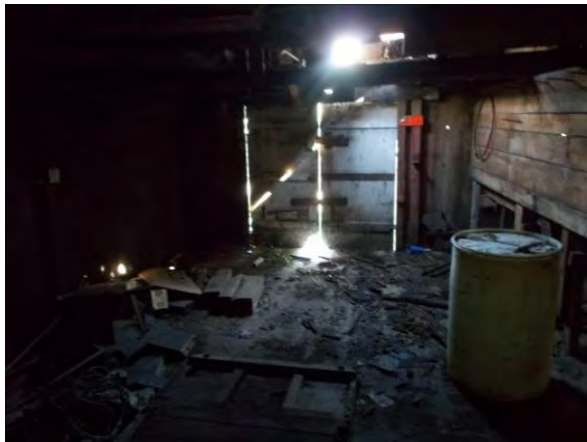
Overview of storage room located to the north of the garage/storage space at 6730 Indiana Street. (Observed on June 18, 2020).
